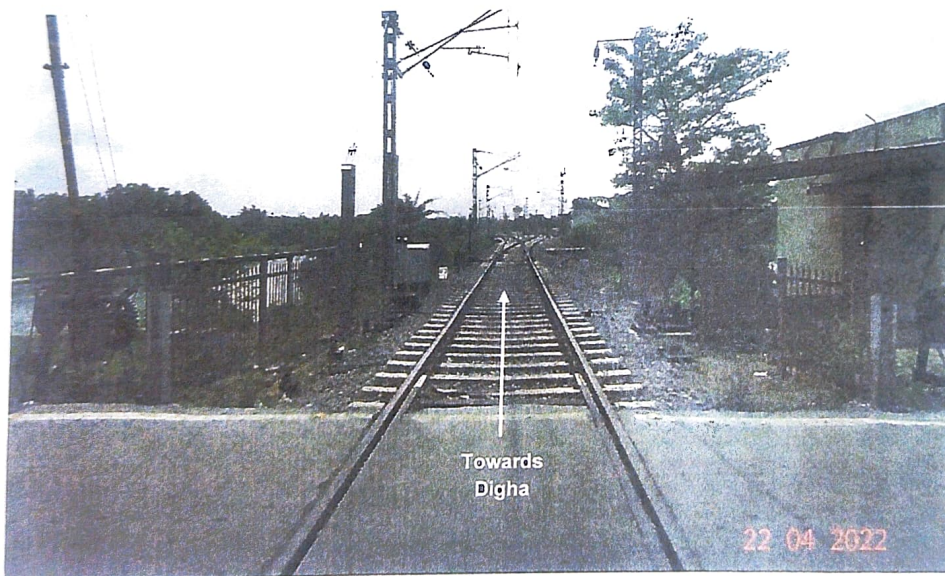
South Eastern Railway (Tamluk-Digha branch)
